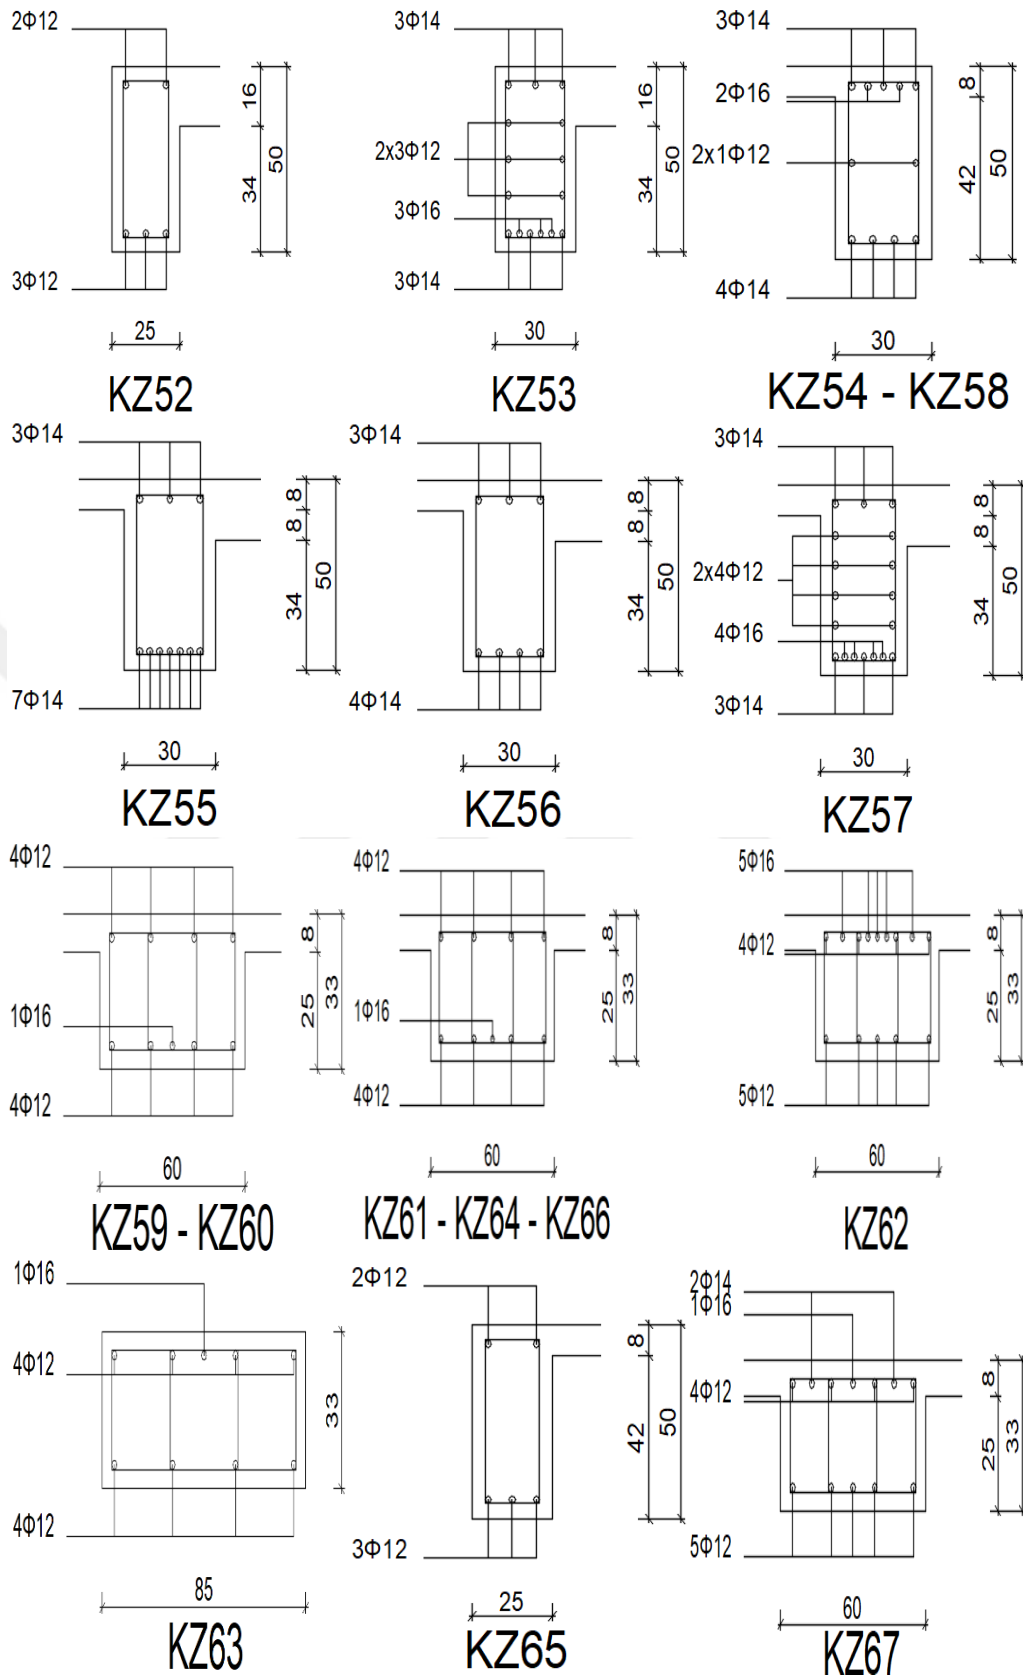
Reinforcement details of beam sections (KZ52-KZ67).
